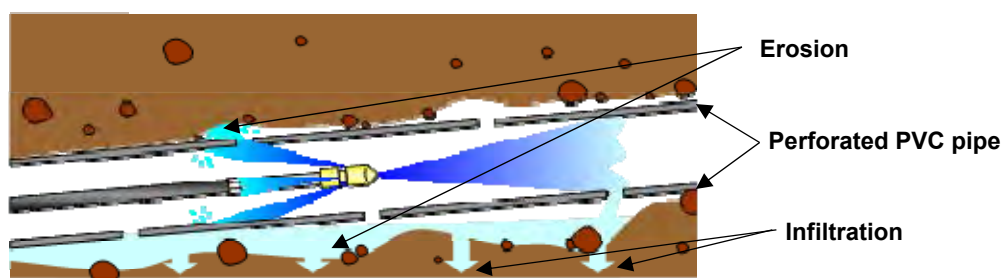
Washing out the soil outside the drainage pipe by a high-pressure water jet (Source: JET)
